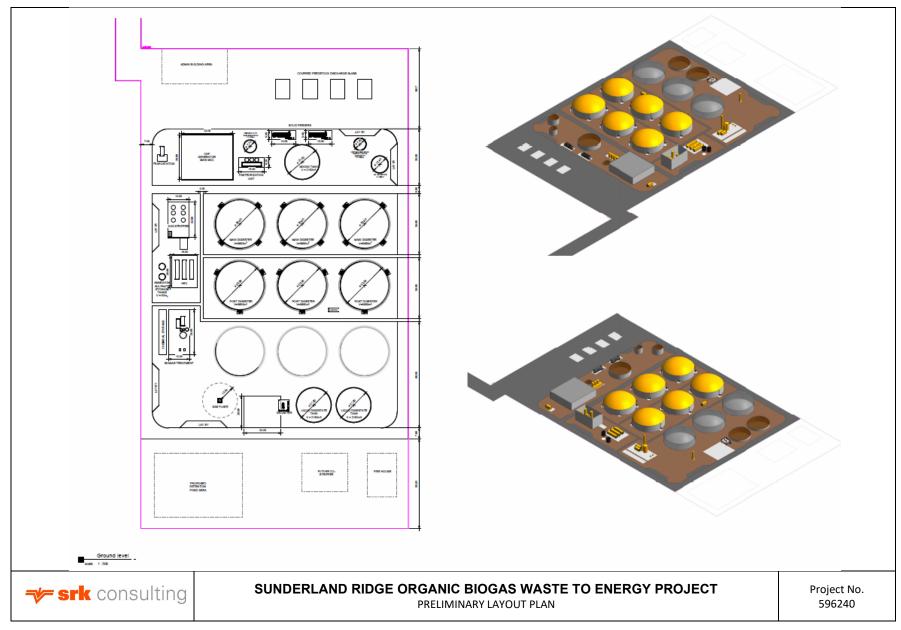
Preliminary layout plan for the Sunderland Ridge Biogas Plant
